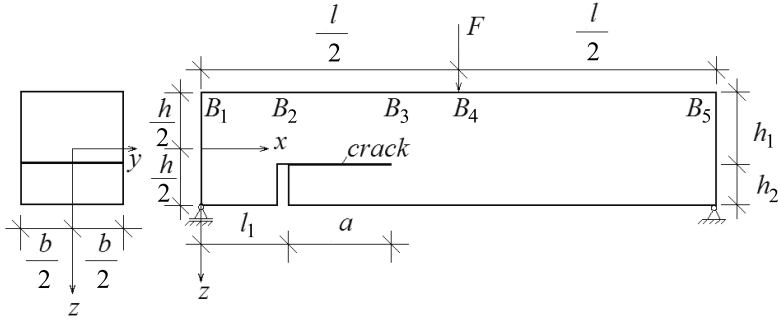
Geometry and loading of a beam structure with a lengthwise crack.
